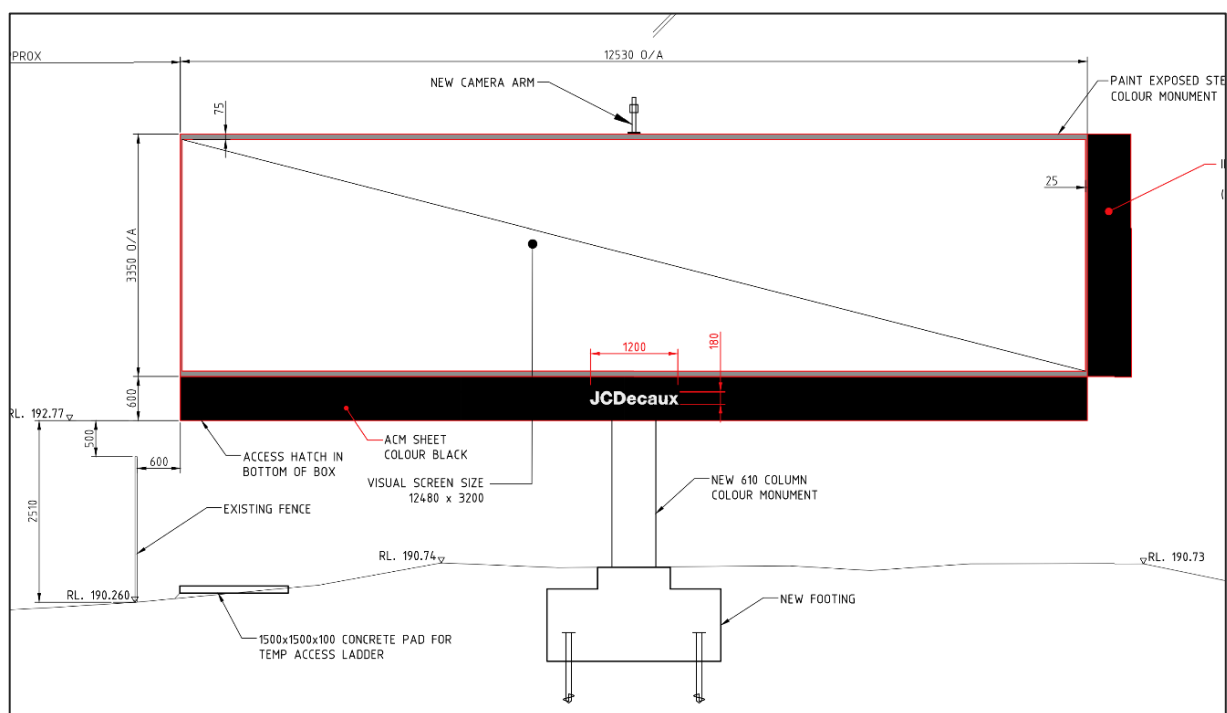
| Proposed south-western elevation (Source: Applicant's documentation)
